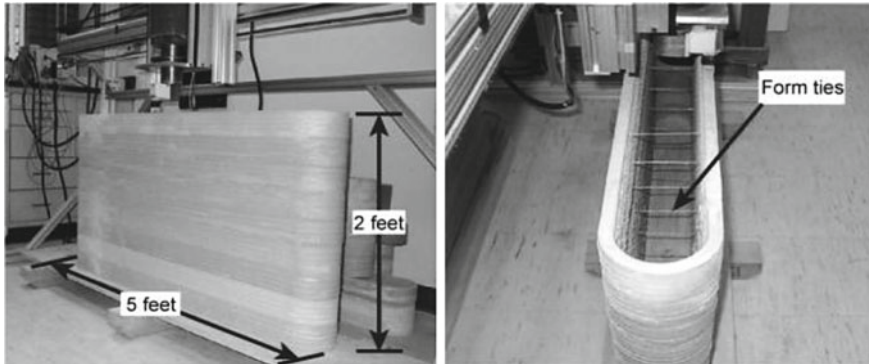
A CC machine-fabricated concrete wall block with custom-made reinforcing ties manually placed within layers [12]
